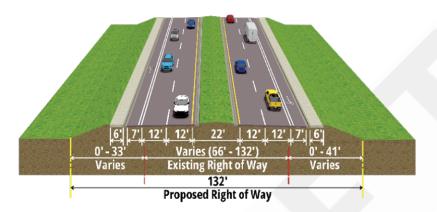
S.R. 60 PREFERRED TYPICAL SECTION 4 (WEST OF KENANSVILLE ROAD TO FLORIDA'S TURNPIKE)
